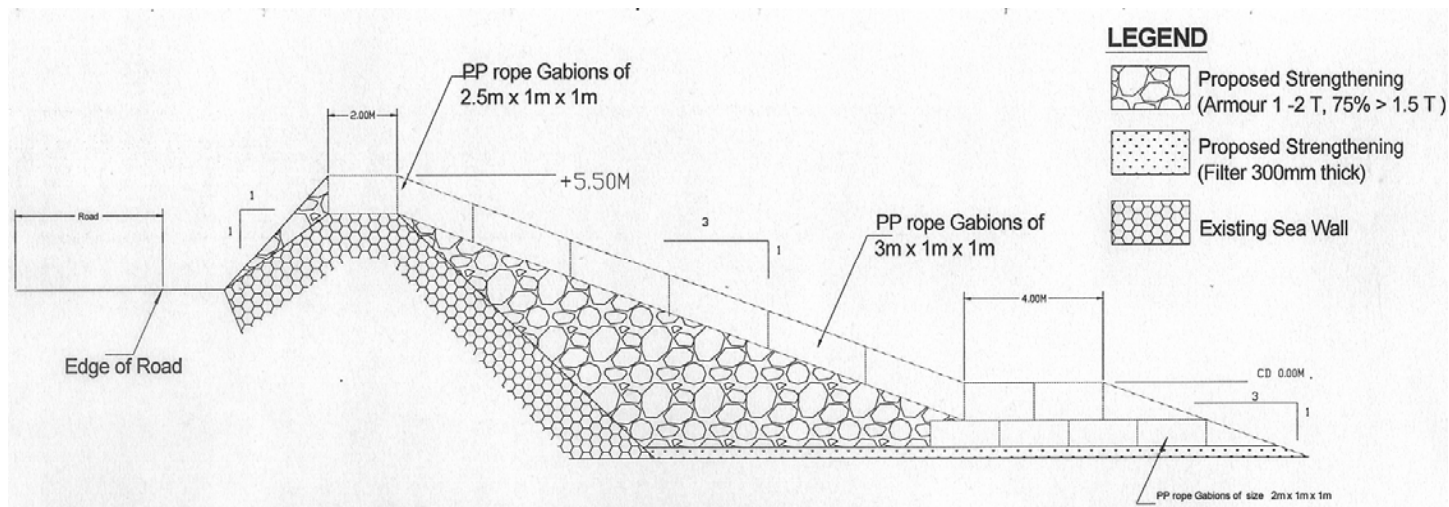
Typical cross section of Sea Wall using PP Gabions
